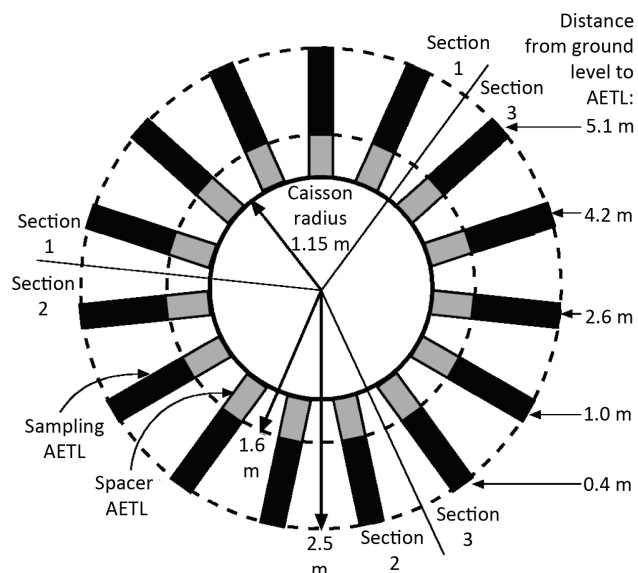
Plan view of the Spydia showing the automated equilibrium tension lysimeter (AETL) positioned around central access caisson.
